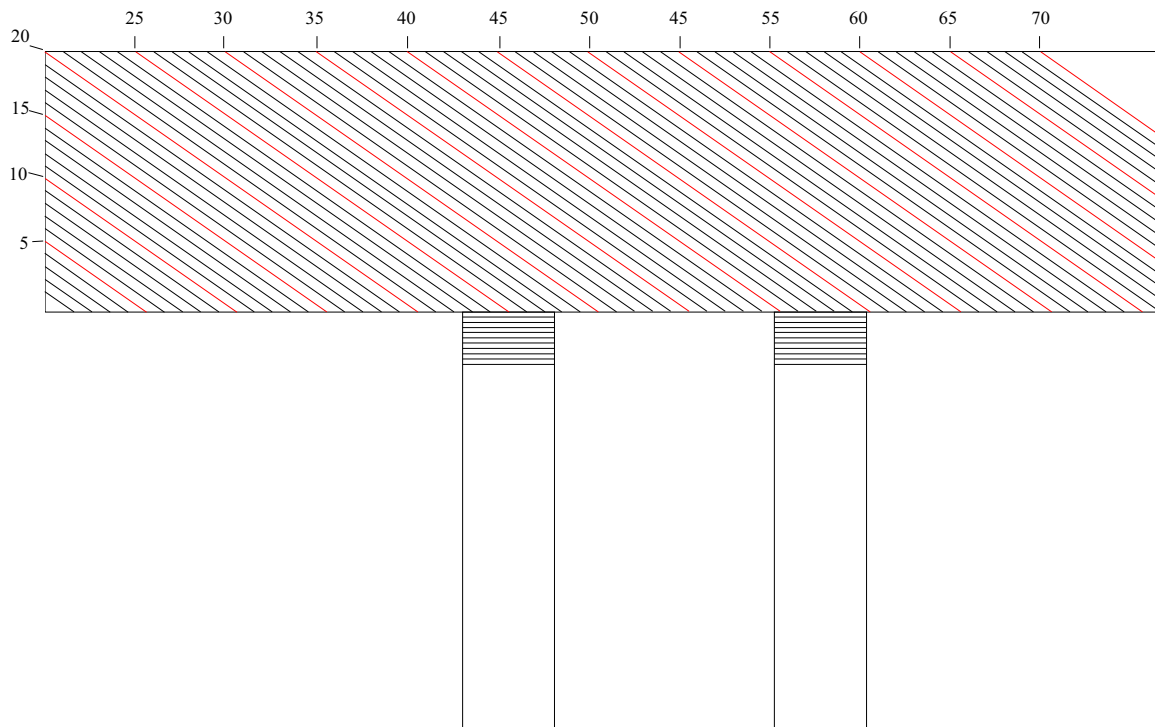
Overview of the backfill layers and their numbering in section 2
